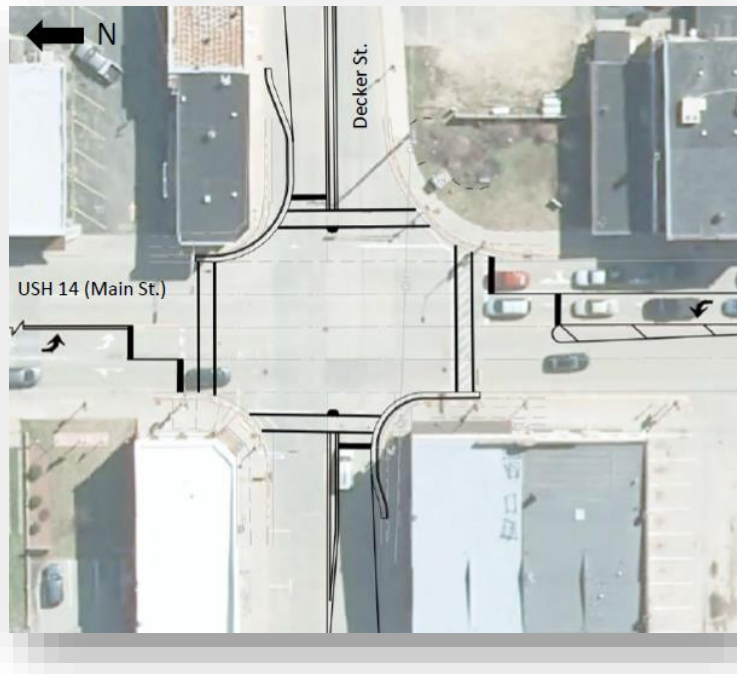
An aerial drawing illustrating planned bump outs at the intersection of Main Street with Decker Street.
